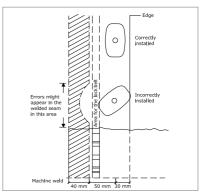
Stress points in the welded seam caused by incorrect installation of fasteners
